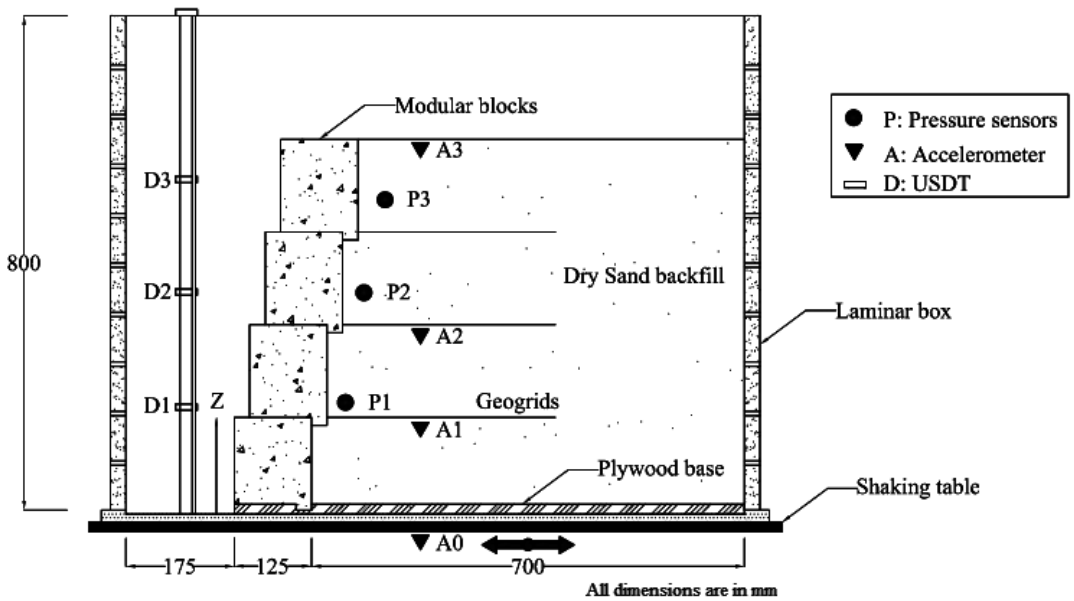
Schematic diagram of typical modular block faced wall configuration and instrumentation
